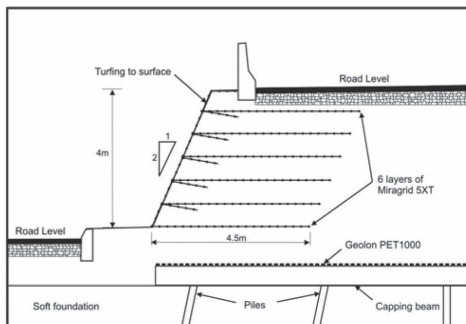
Cross-section of reinforced embankment side slope at Wat Nakorn-In Project, contract EW1.
